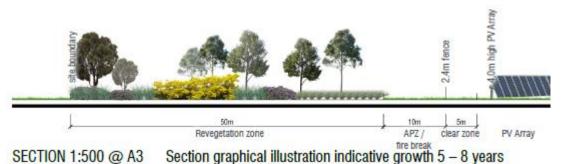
Indicative site boundary to solar infrastructure cross section
